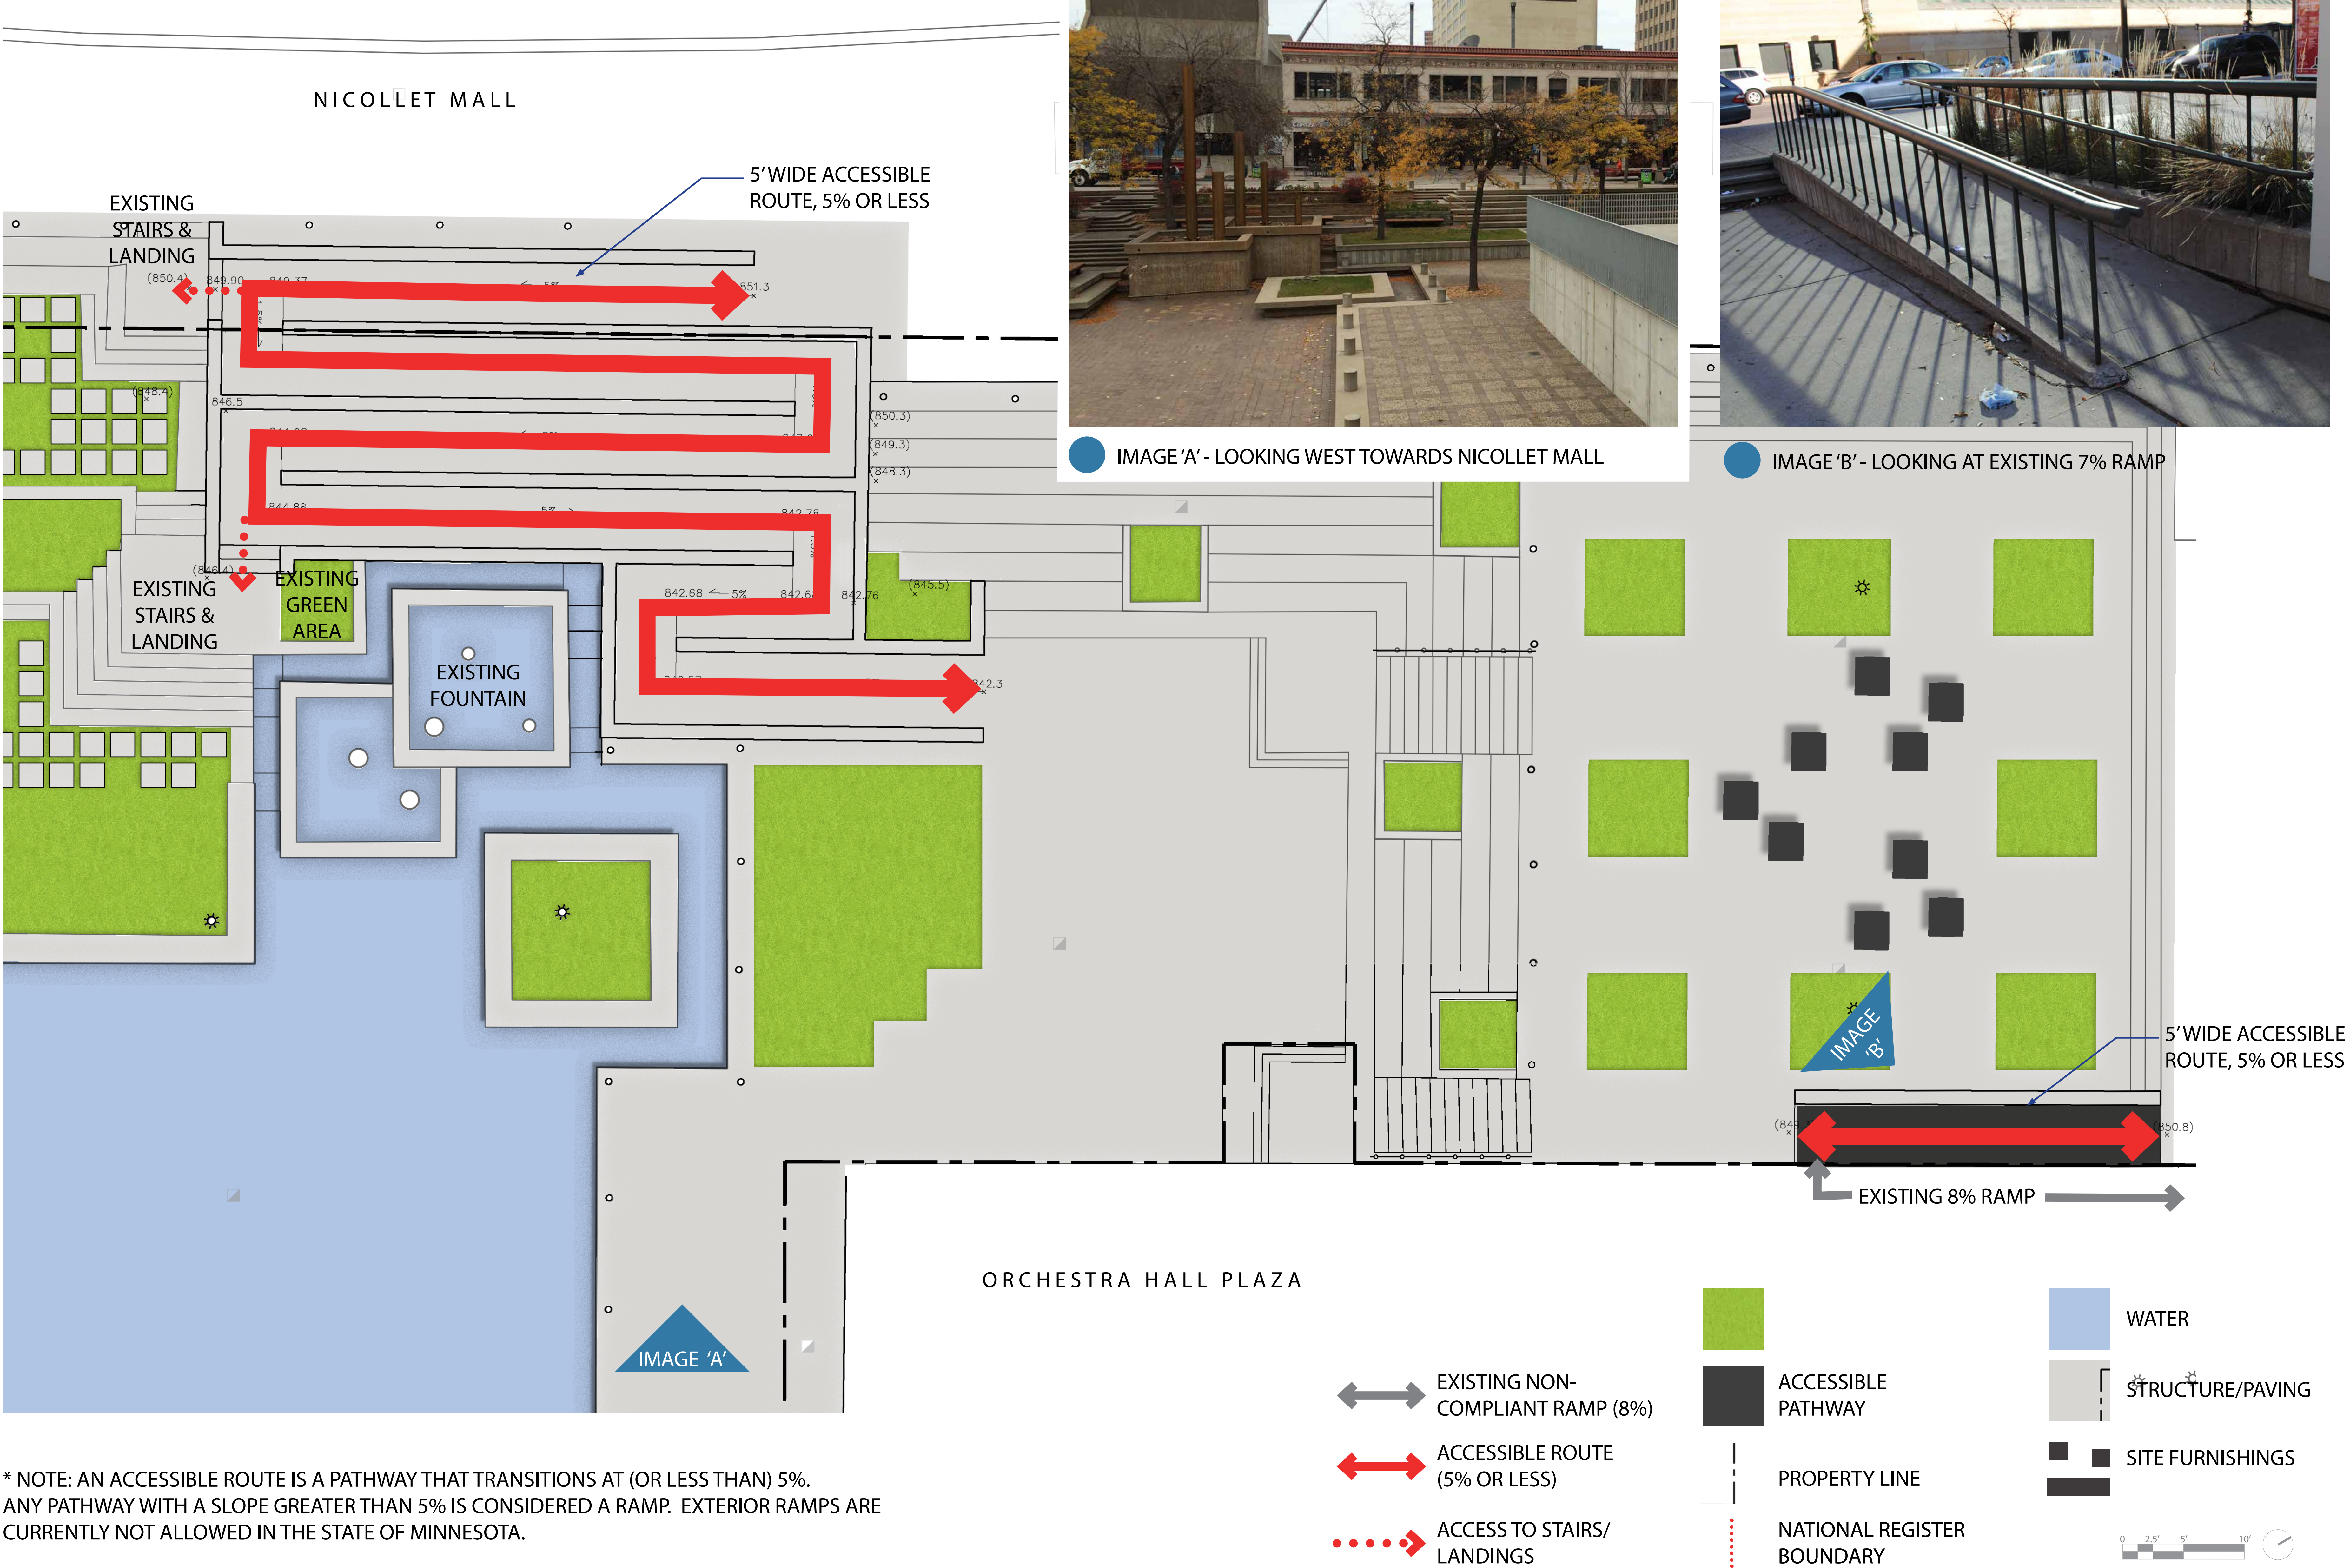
IMAGE 'B' - LOOKING NORTH AT EXISTING RAMP
